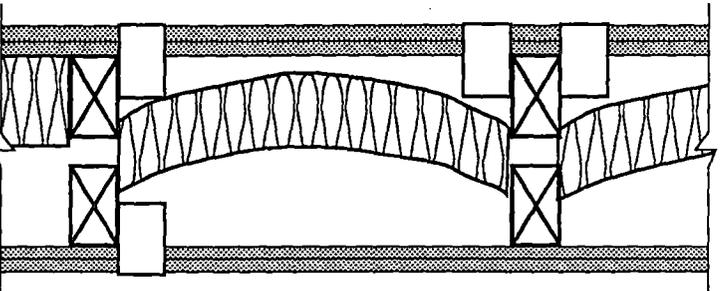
Positions of electrical boxes in the staggered stud wall. The wall was constructed in the following manner:
